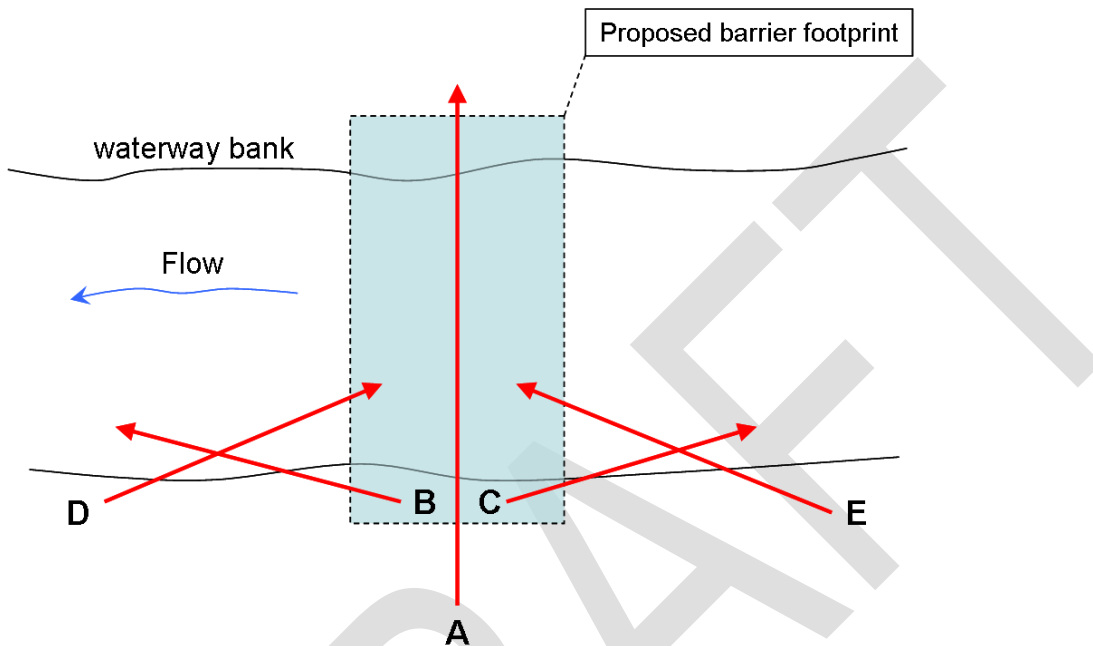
Generalised plan view of a site showing the location of photos to be taken for pre- and post-works notification.
